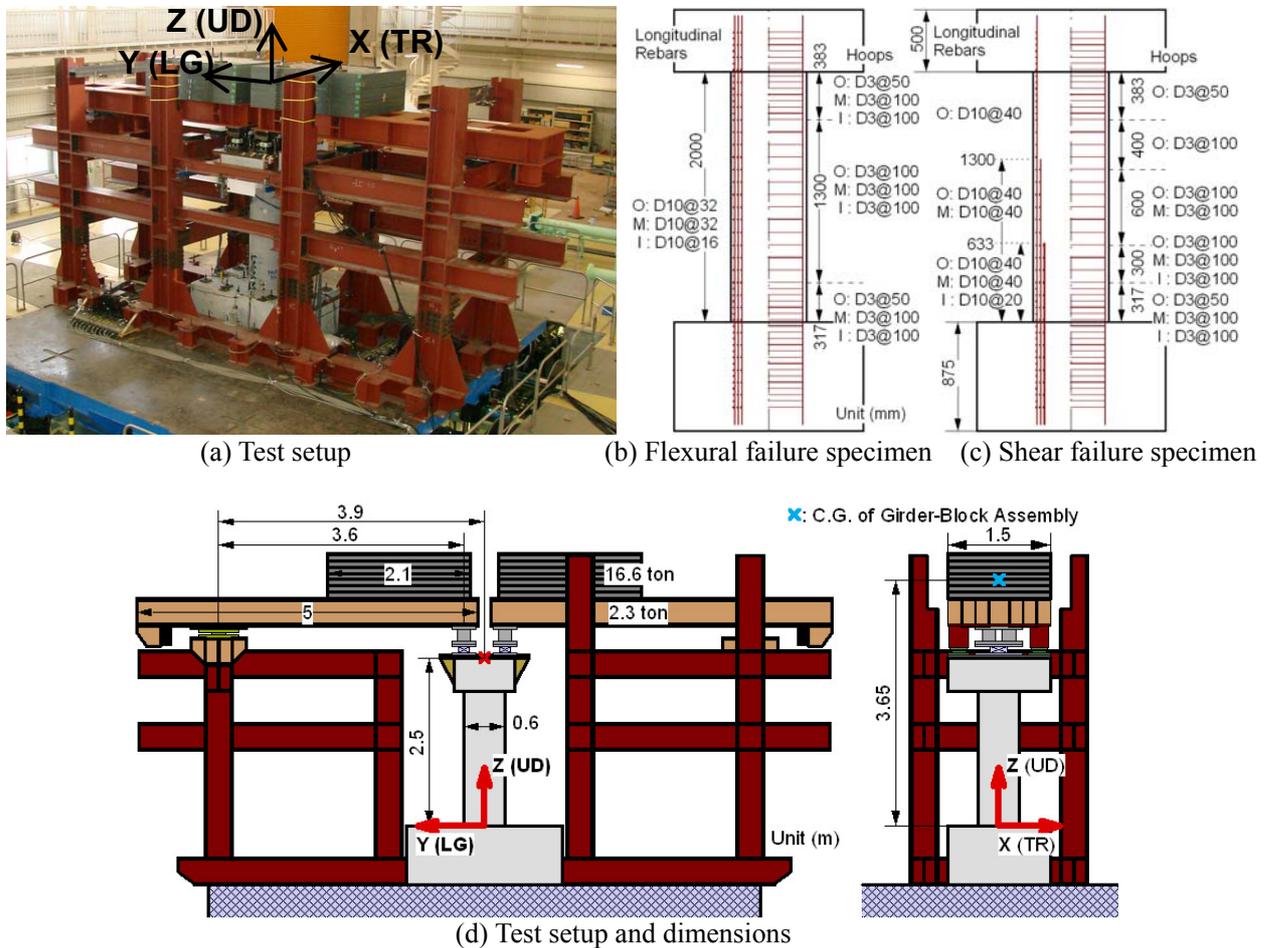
Test setup and specimens of 1/3-scaled bridge column models
